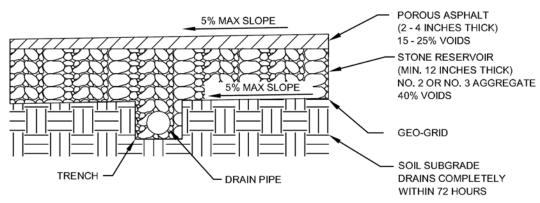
C. Porous Asphalt Trench Outlet
